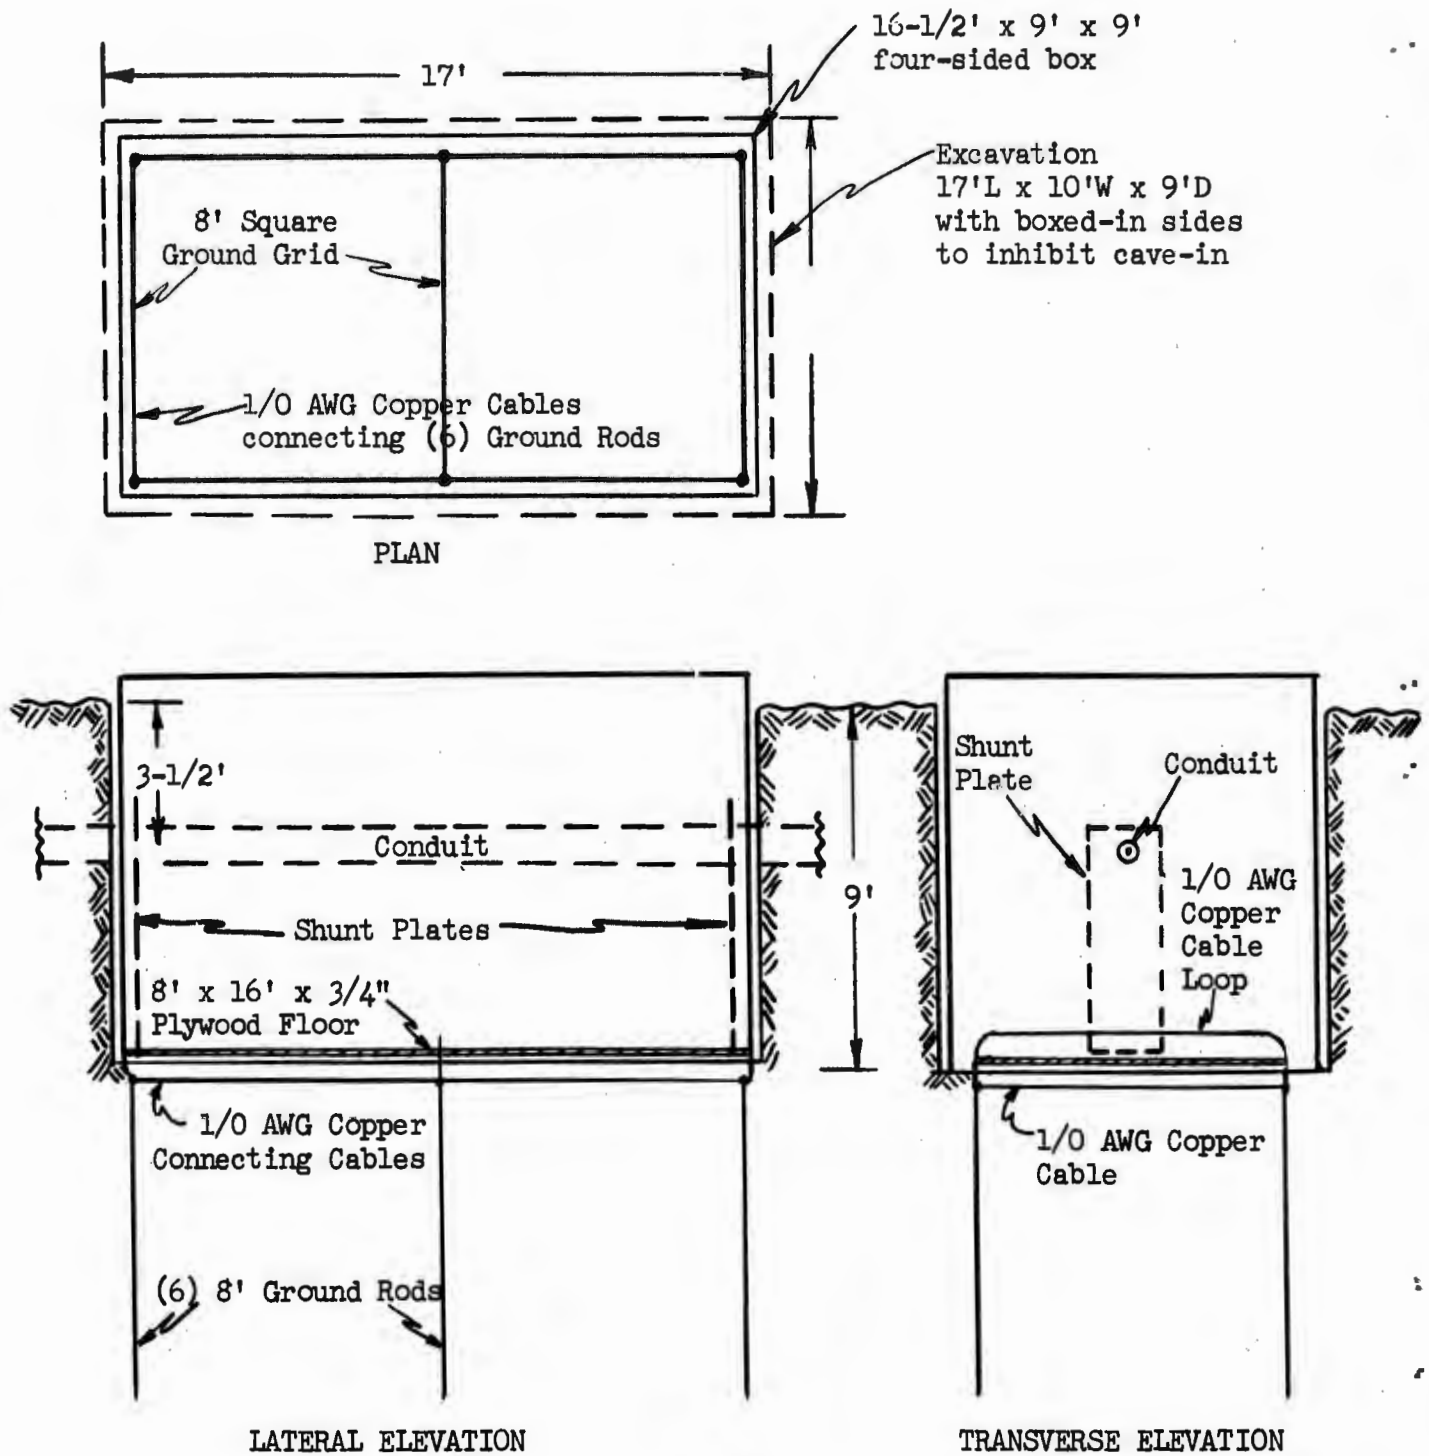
Grounding System Arrangement in Excavation at Center of Conduit Run
